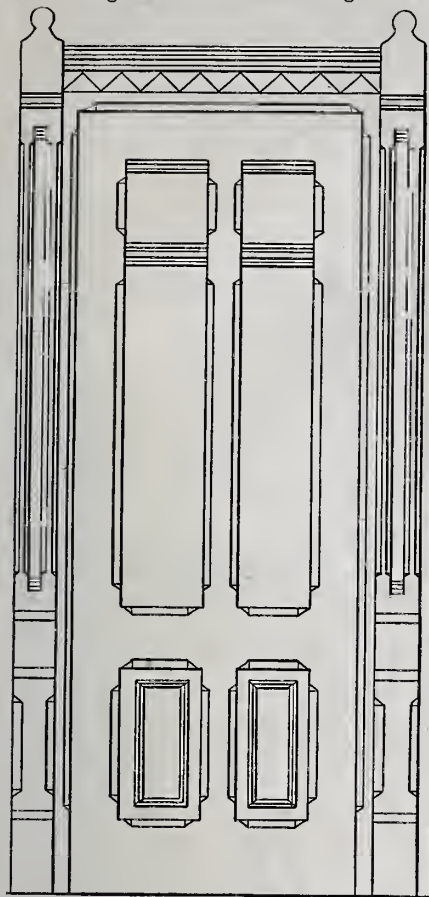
Principal Doors, First Story—Scale, $\frac{1}{2}$ -inch to 1 foot.
